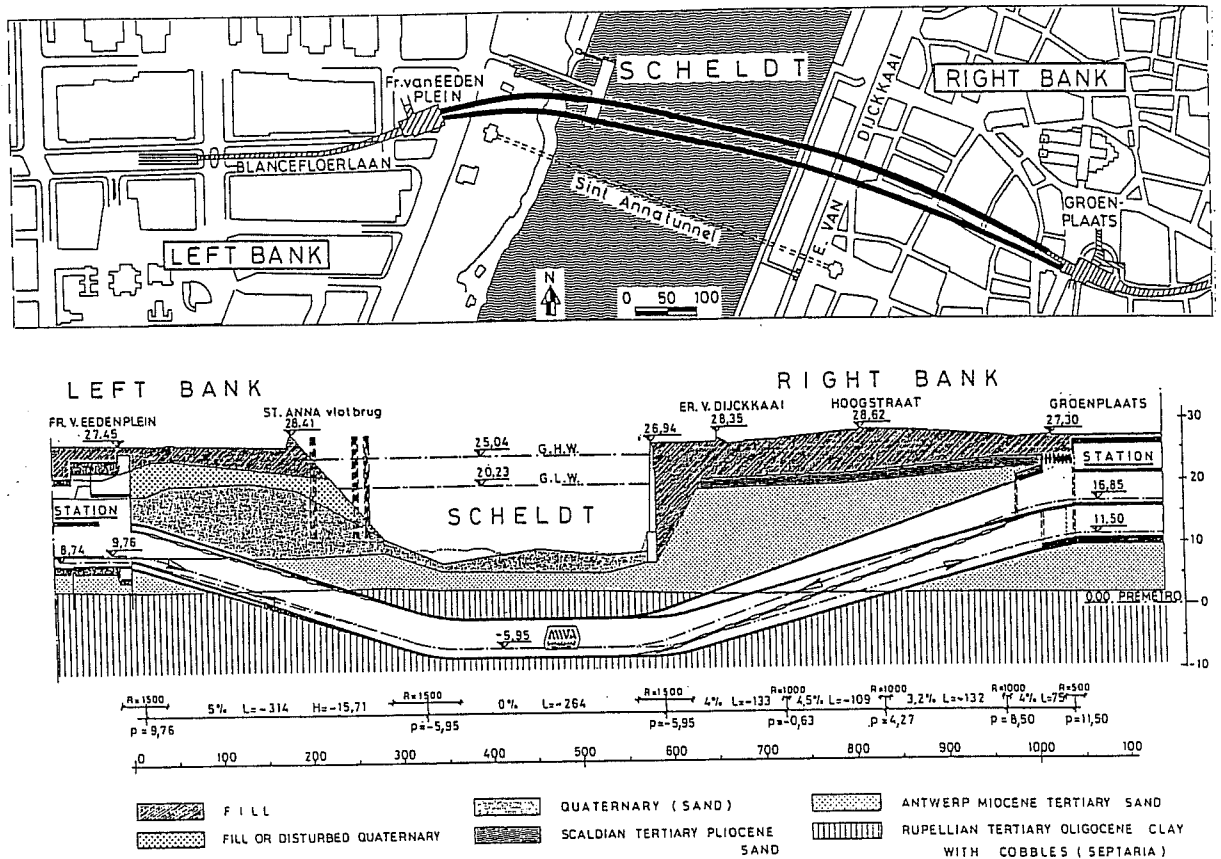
Location and vertical alignment of the new PREMETRO tunnel
